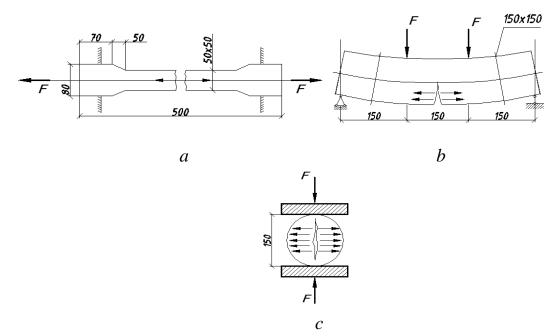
Scheme of sample test to determine the tensile strength of concrete: a - the tear; b - the bend of concrete beams; c - the splitting cylinder
